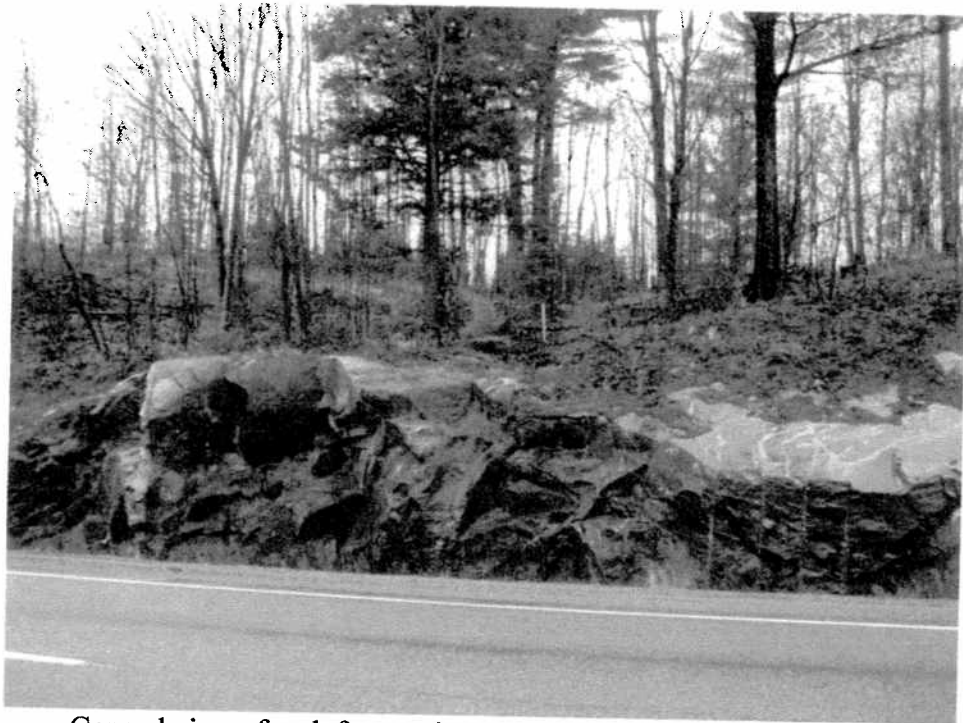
General view of rock face at site. Note centreline stake, drill hole half barrels to north (right of image) and more broken rock mass to south.
